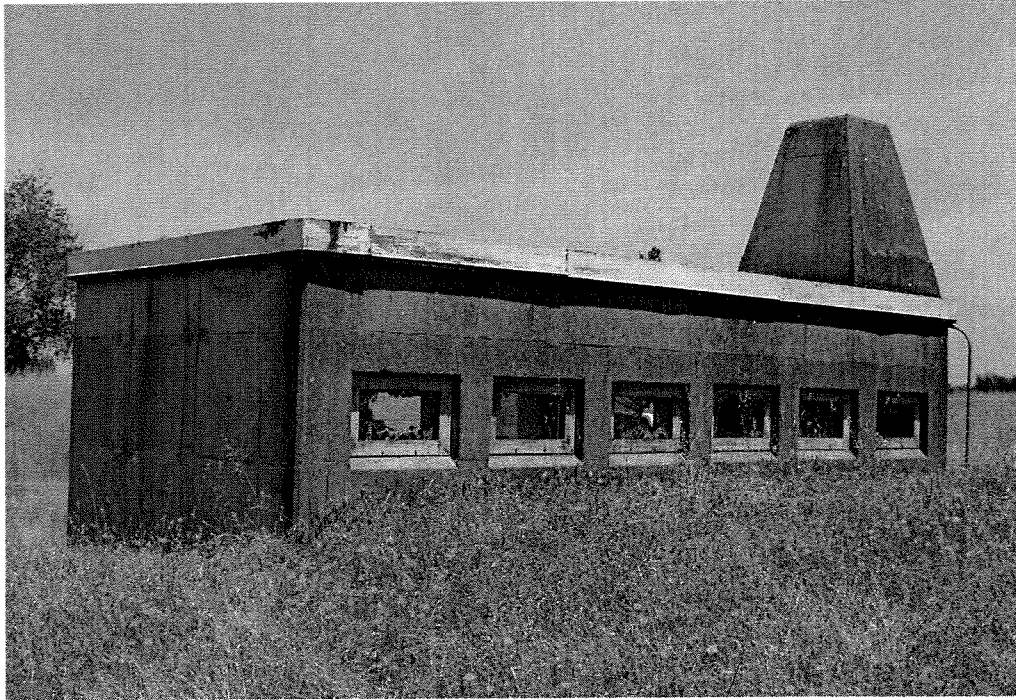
Observation Shelter No. 2, Alpha Test Complex, 1956-1957. Looking northeast. View of May 2005.
